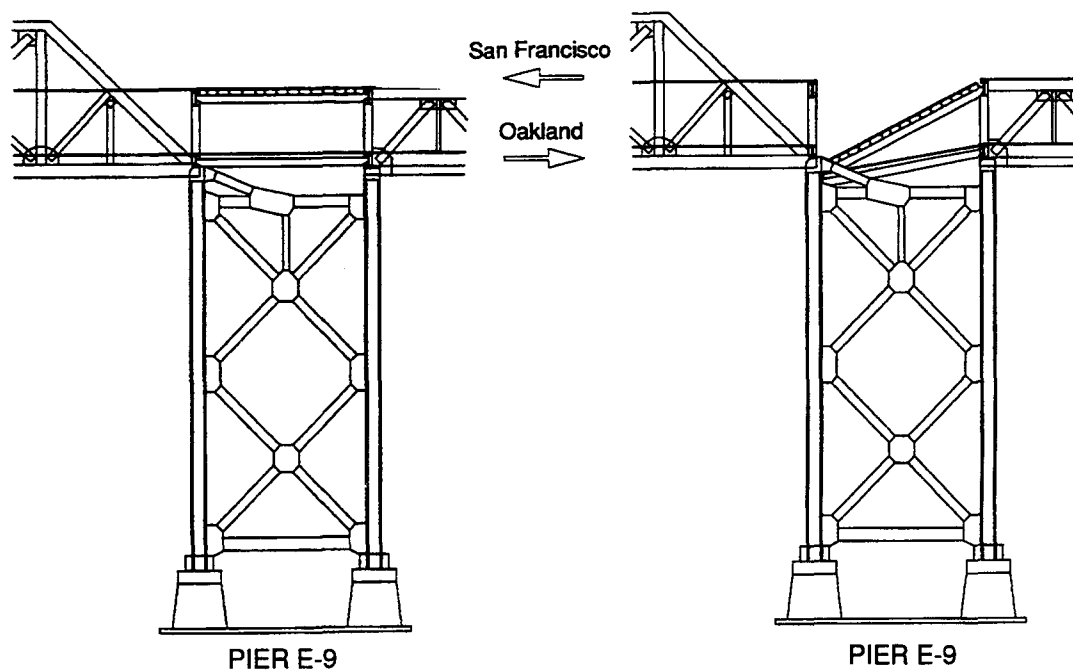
Schematic detail of Pier E-9 looking north. Evidence indicates that the 88.4 m truss segment on the east side of the pier moved eastward, simultaneously unseating both upper and lower deck segments.
